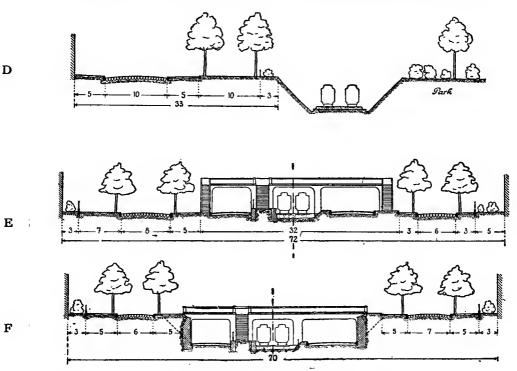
, 13, and 14. cross sections of proposed arterial streets, berlin
